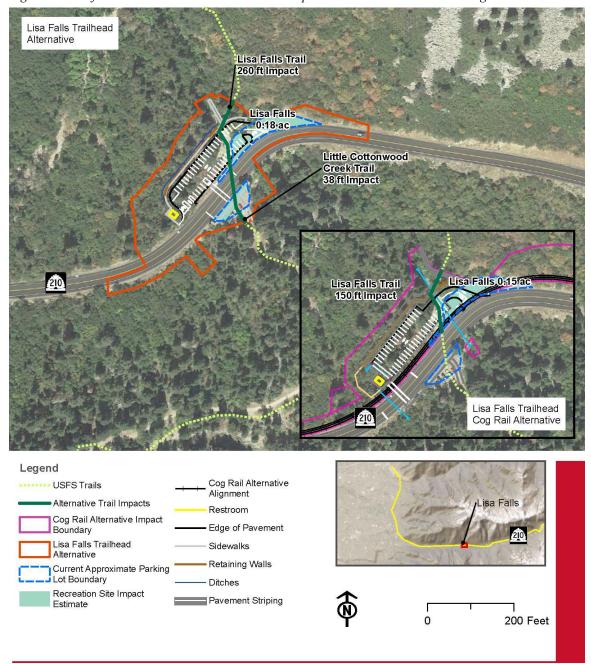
Use of Lisa Falls Trail with the Trailhead Improvement Alternatives or the Cog Rail Alternative
